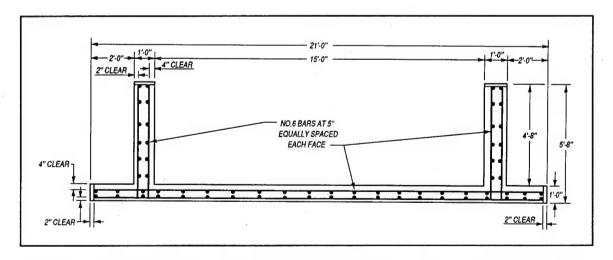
Precast concrete low-flow sections, Blue River Channel (after Mitscher 1991)
